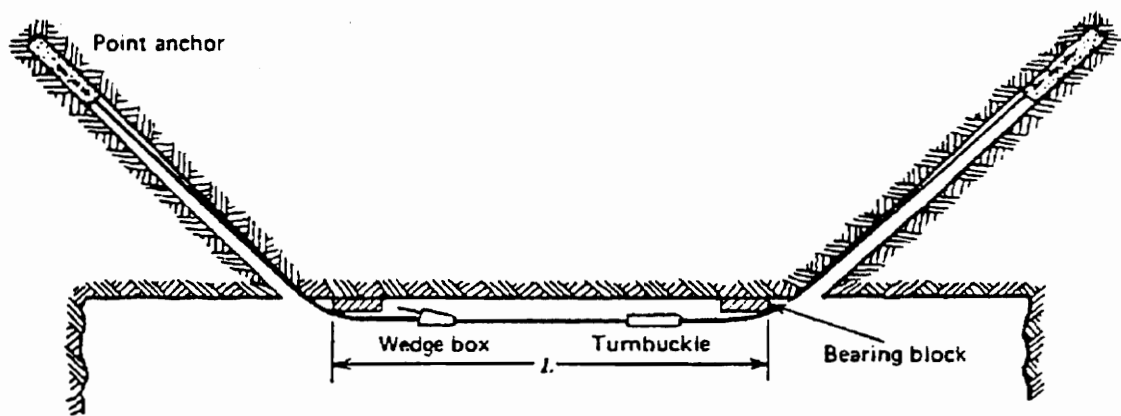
Typical layout of an installed roof truss system (Biron and Arioglu, 1982).
